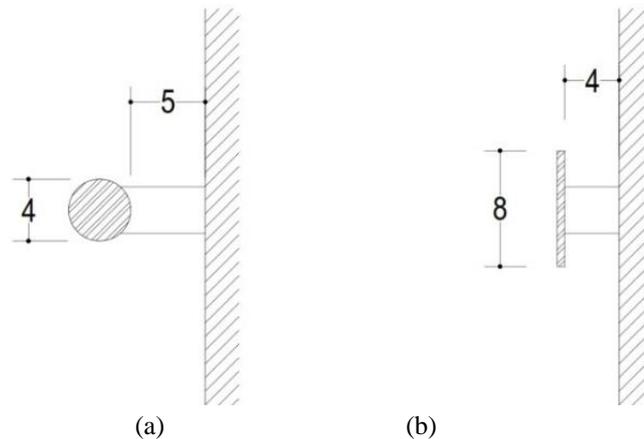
Handrail on elevator Type A and B; (b) Handrail on elevator Type C
